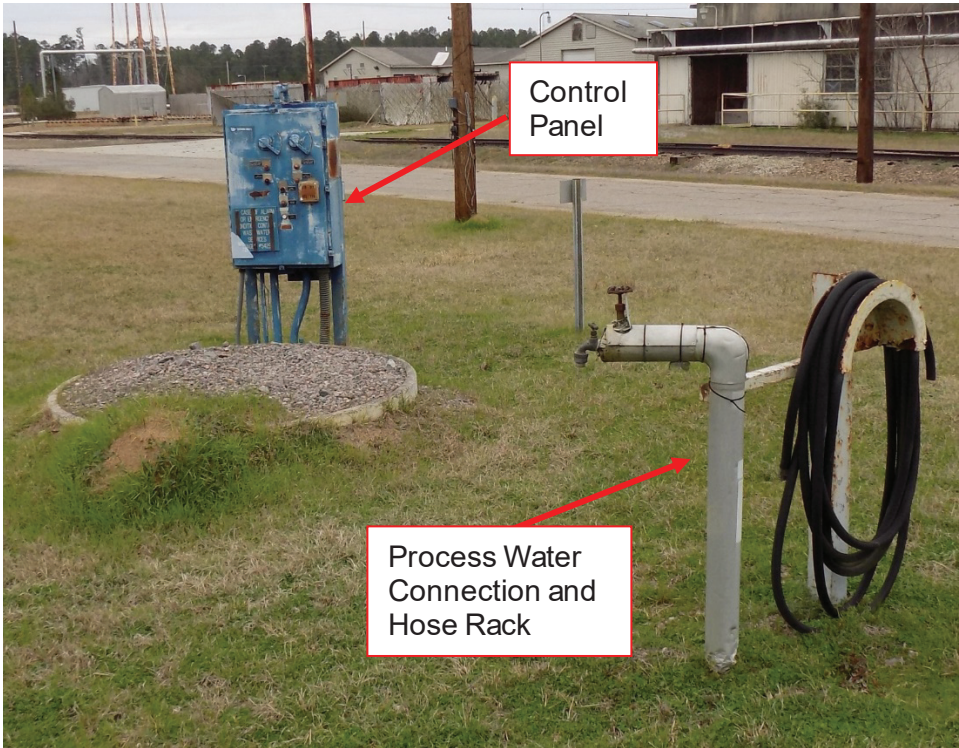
Building 607-2D, Sewage Lift Station #2 and Process Water Hose Connection
